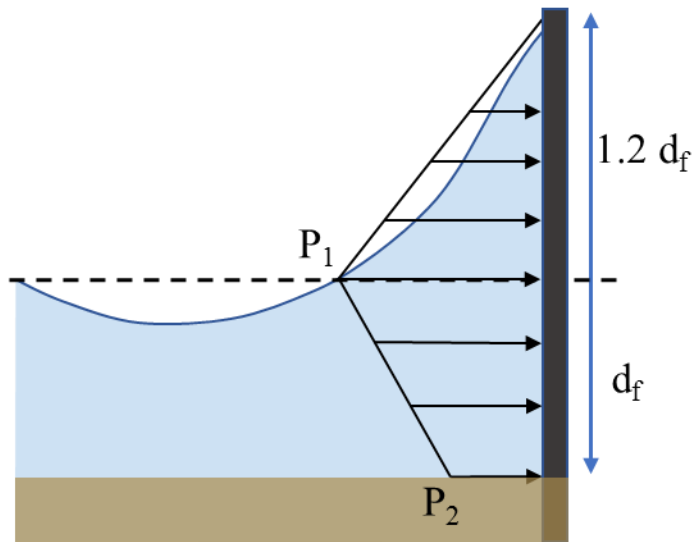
Breaking wave loads on vertical walls, adapted from FEMA
